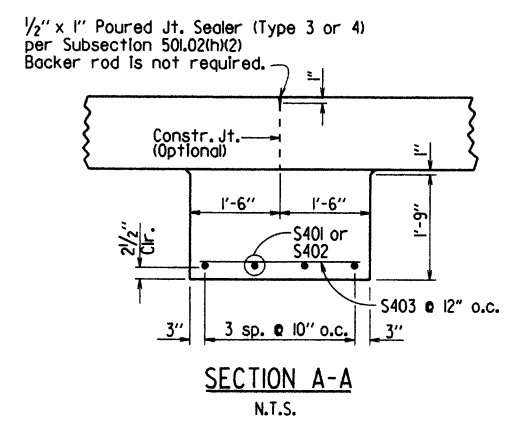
DETAILS OF LONGITUDINAL CONSTRUCTION JOINT
